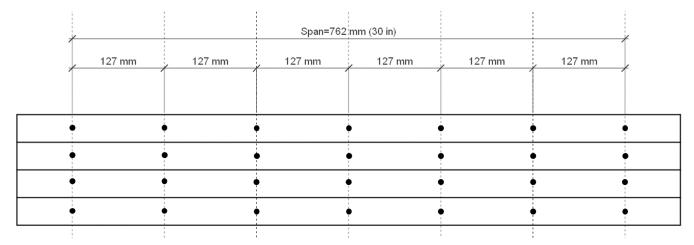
NLT bending-shear test specimen: nail locations for plywood sheathing
